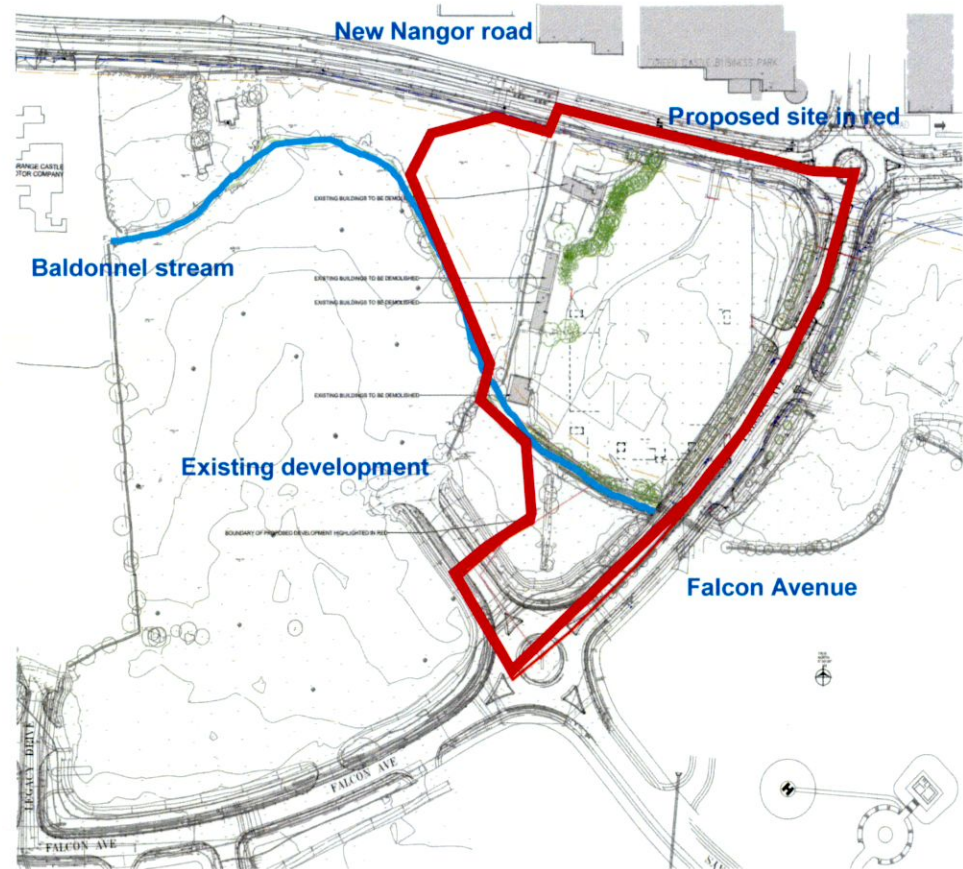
Existing Site Plan, with Proposed Site outlined in Red
